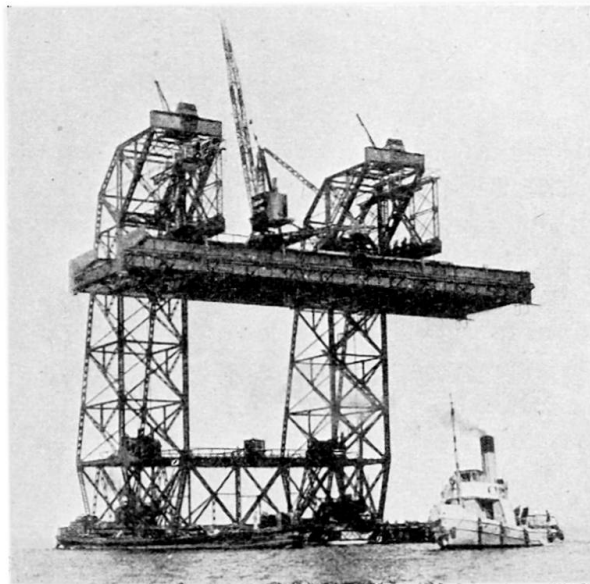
Storstrom Bridge. Floating crane lifting 500-ton side span complete with erection crane on it
